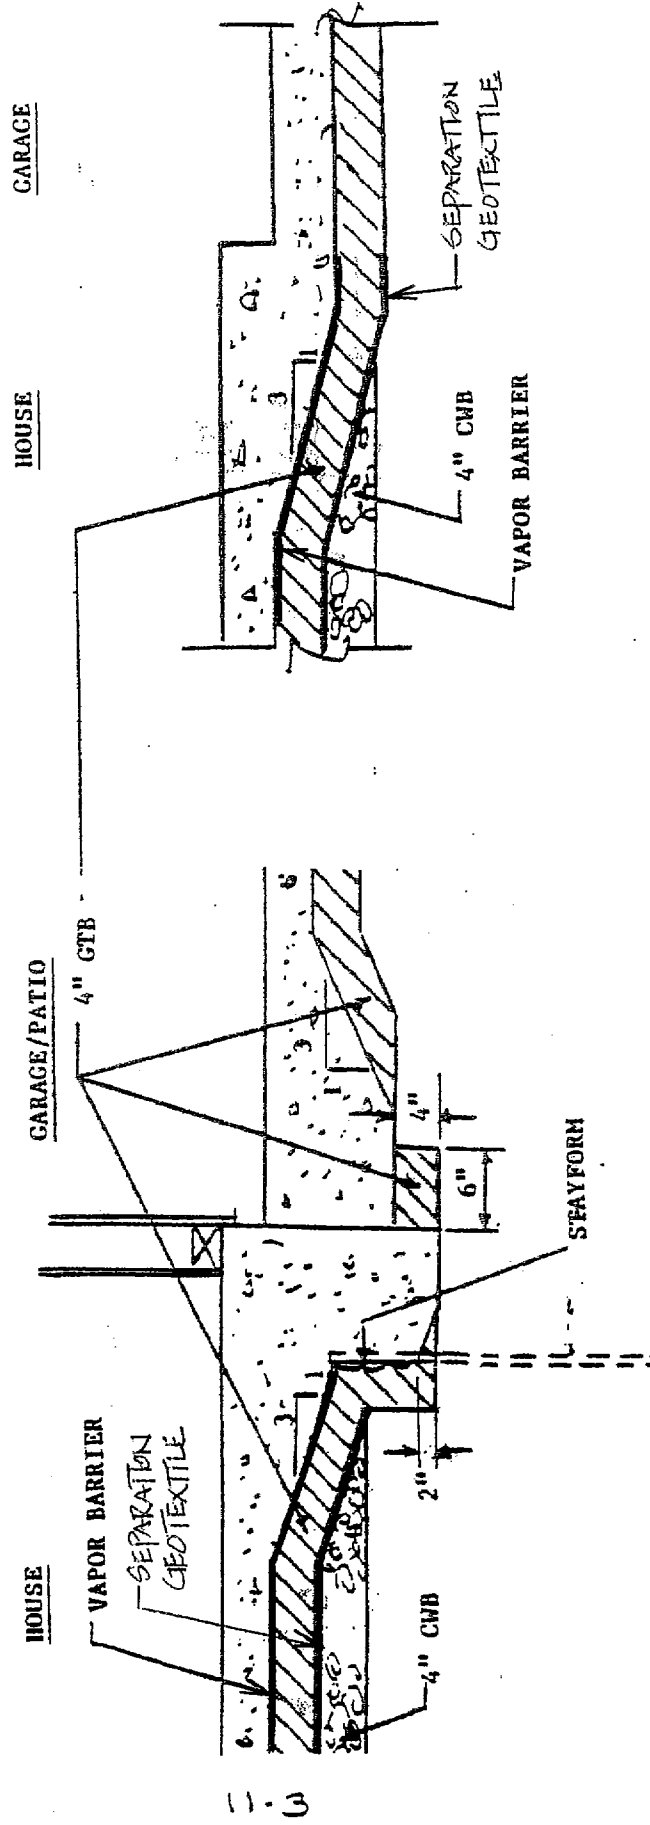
TYPICAL GTB DETAILS AT HOUSE TO GARAGE/PATIO INTERFACE
